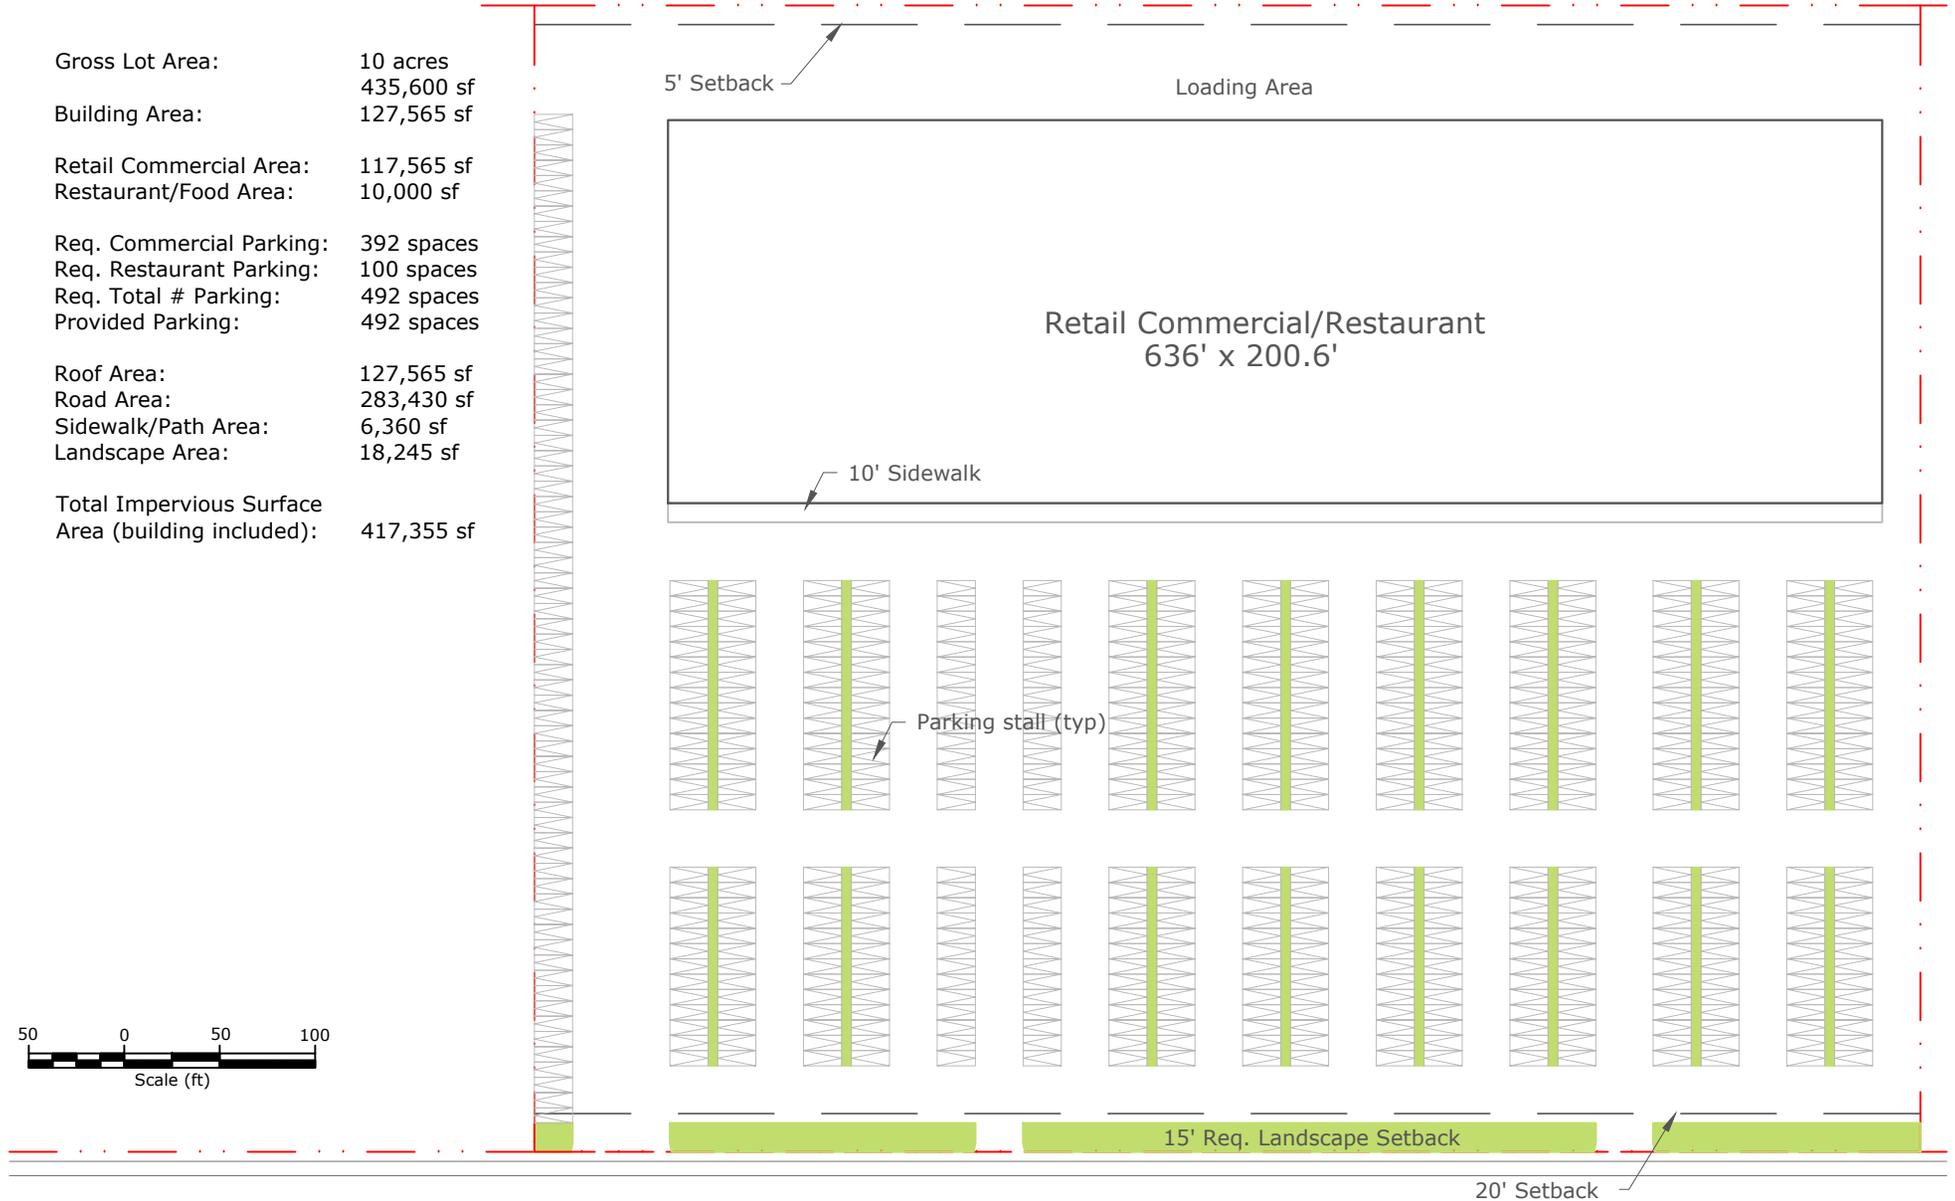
Scenario 11 to 14. Large Commercial Development Plan
